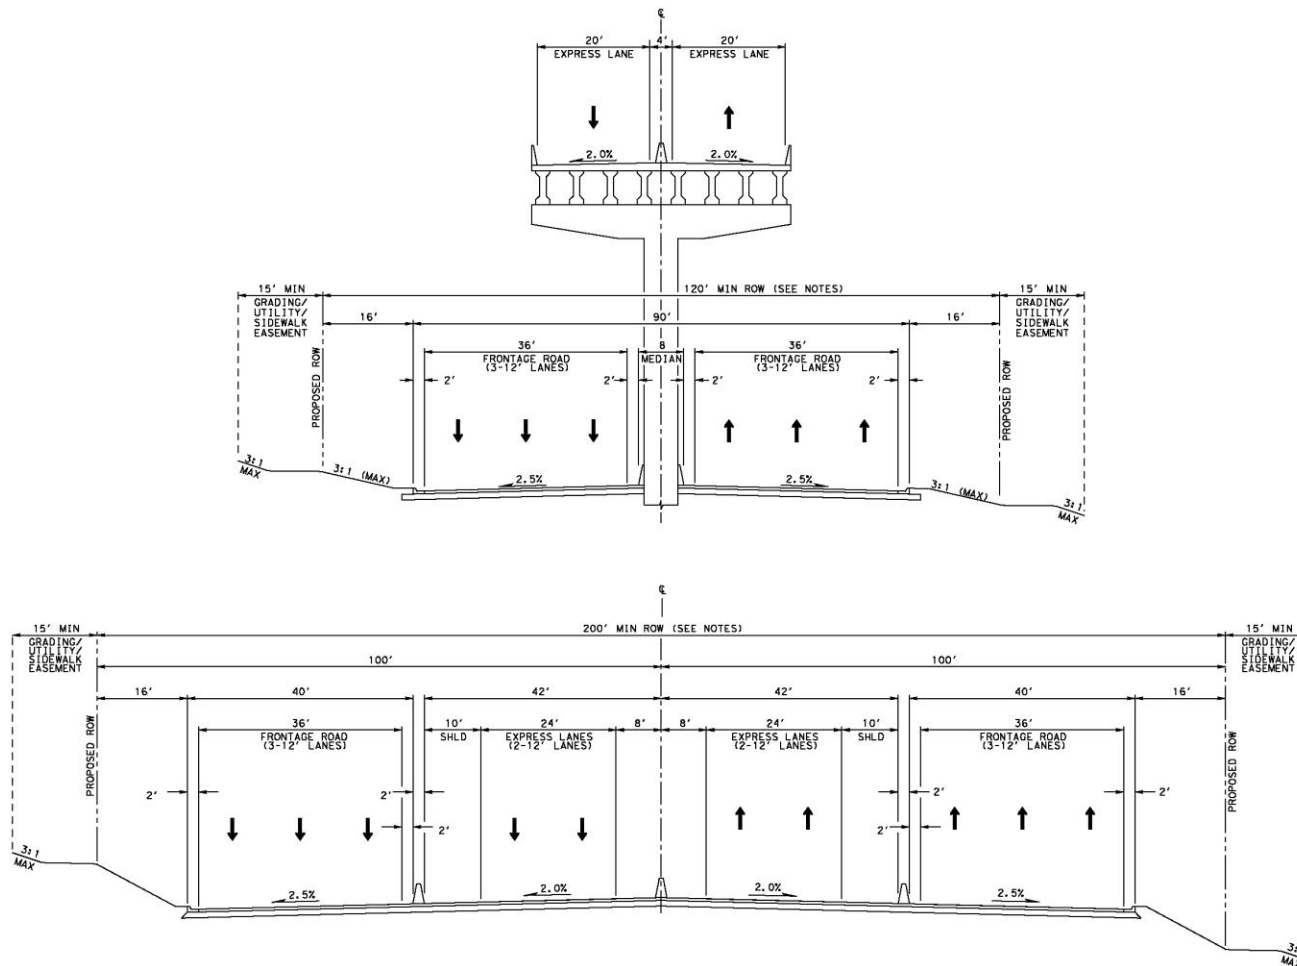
H: EXPRESSWAY TYPICAL SECTIONS (CONSTRAINED ROW)
